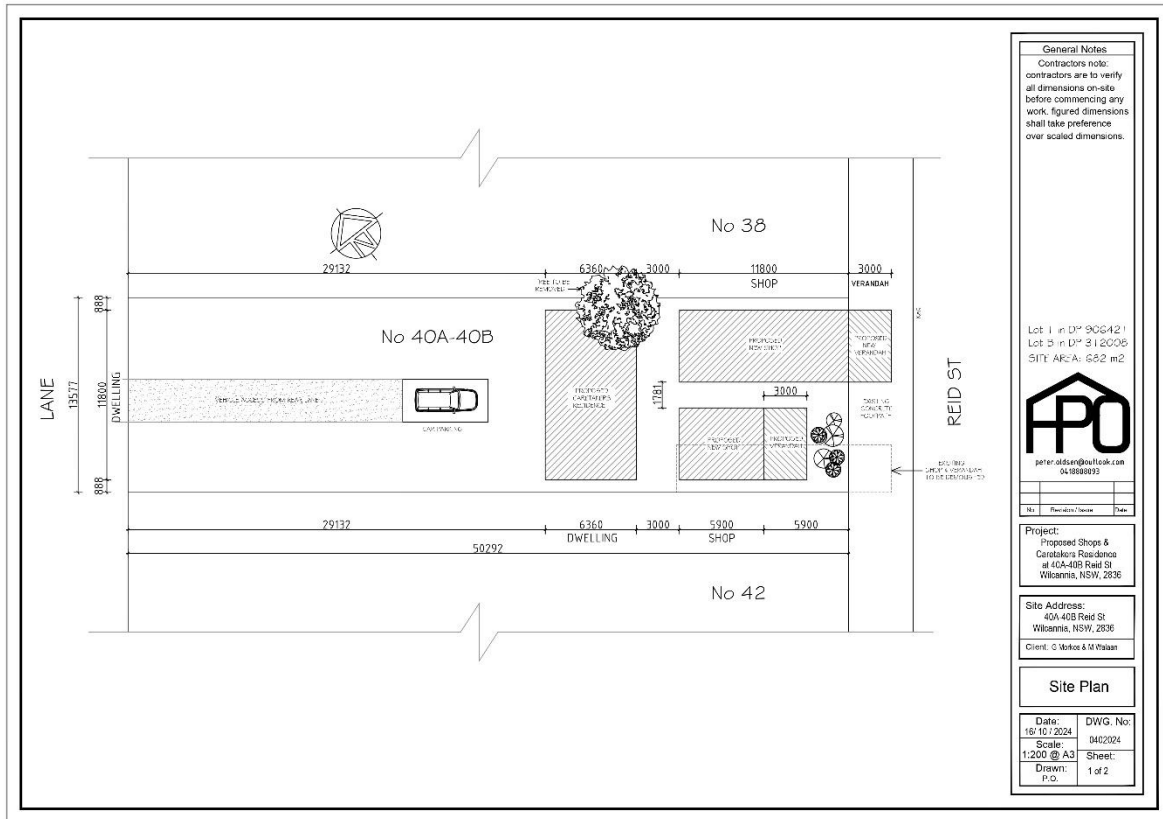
Proposed site plan new shops & caretakers residence 40A-40B Reid St Wilcannia
